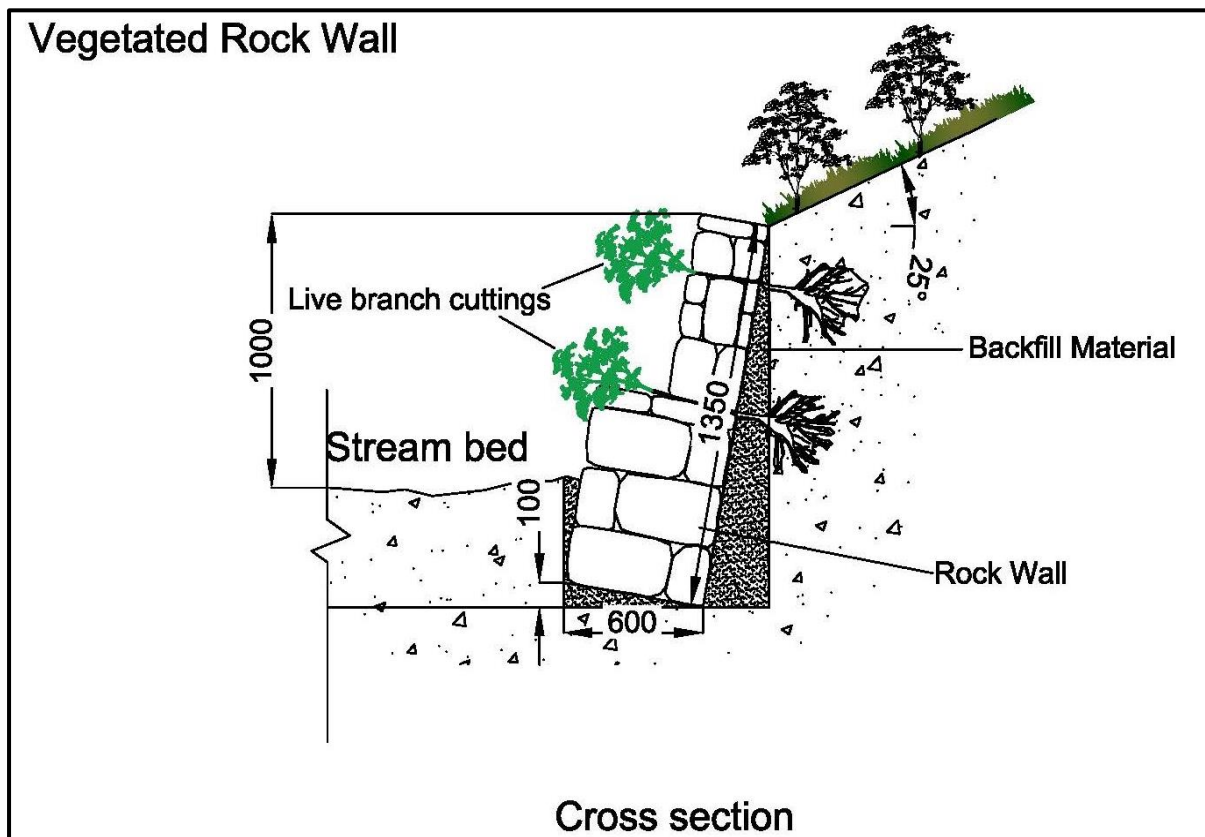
Cross section of proposed Vegetated Rock Wall with initial sizing in mm
